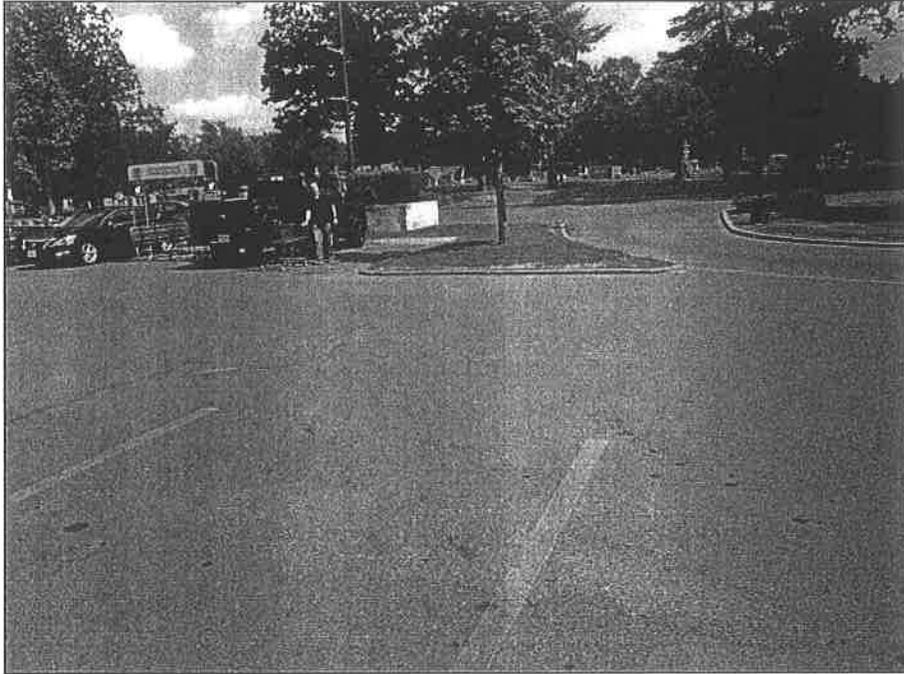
Proposed Hannaford To Go location from the northwest and adjacent drive-through driveway to remain
